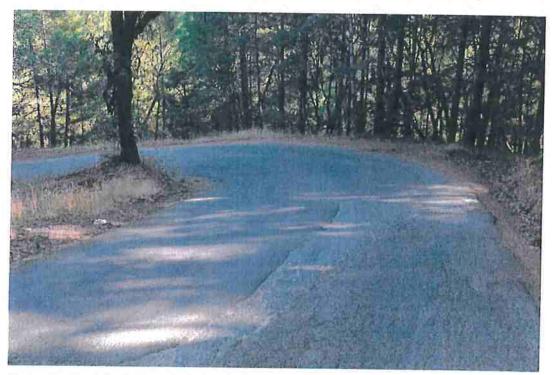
Mile 3.2: 20-ft road width with 2-ft shoulders.
